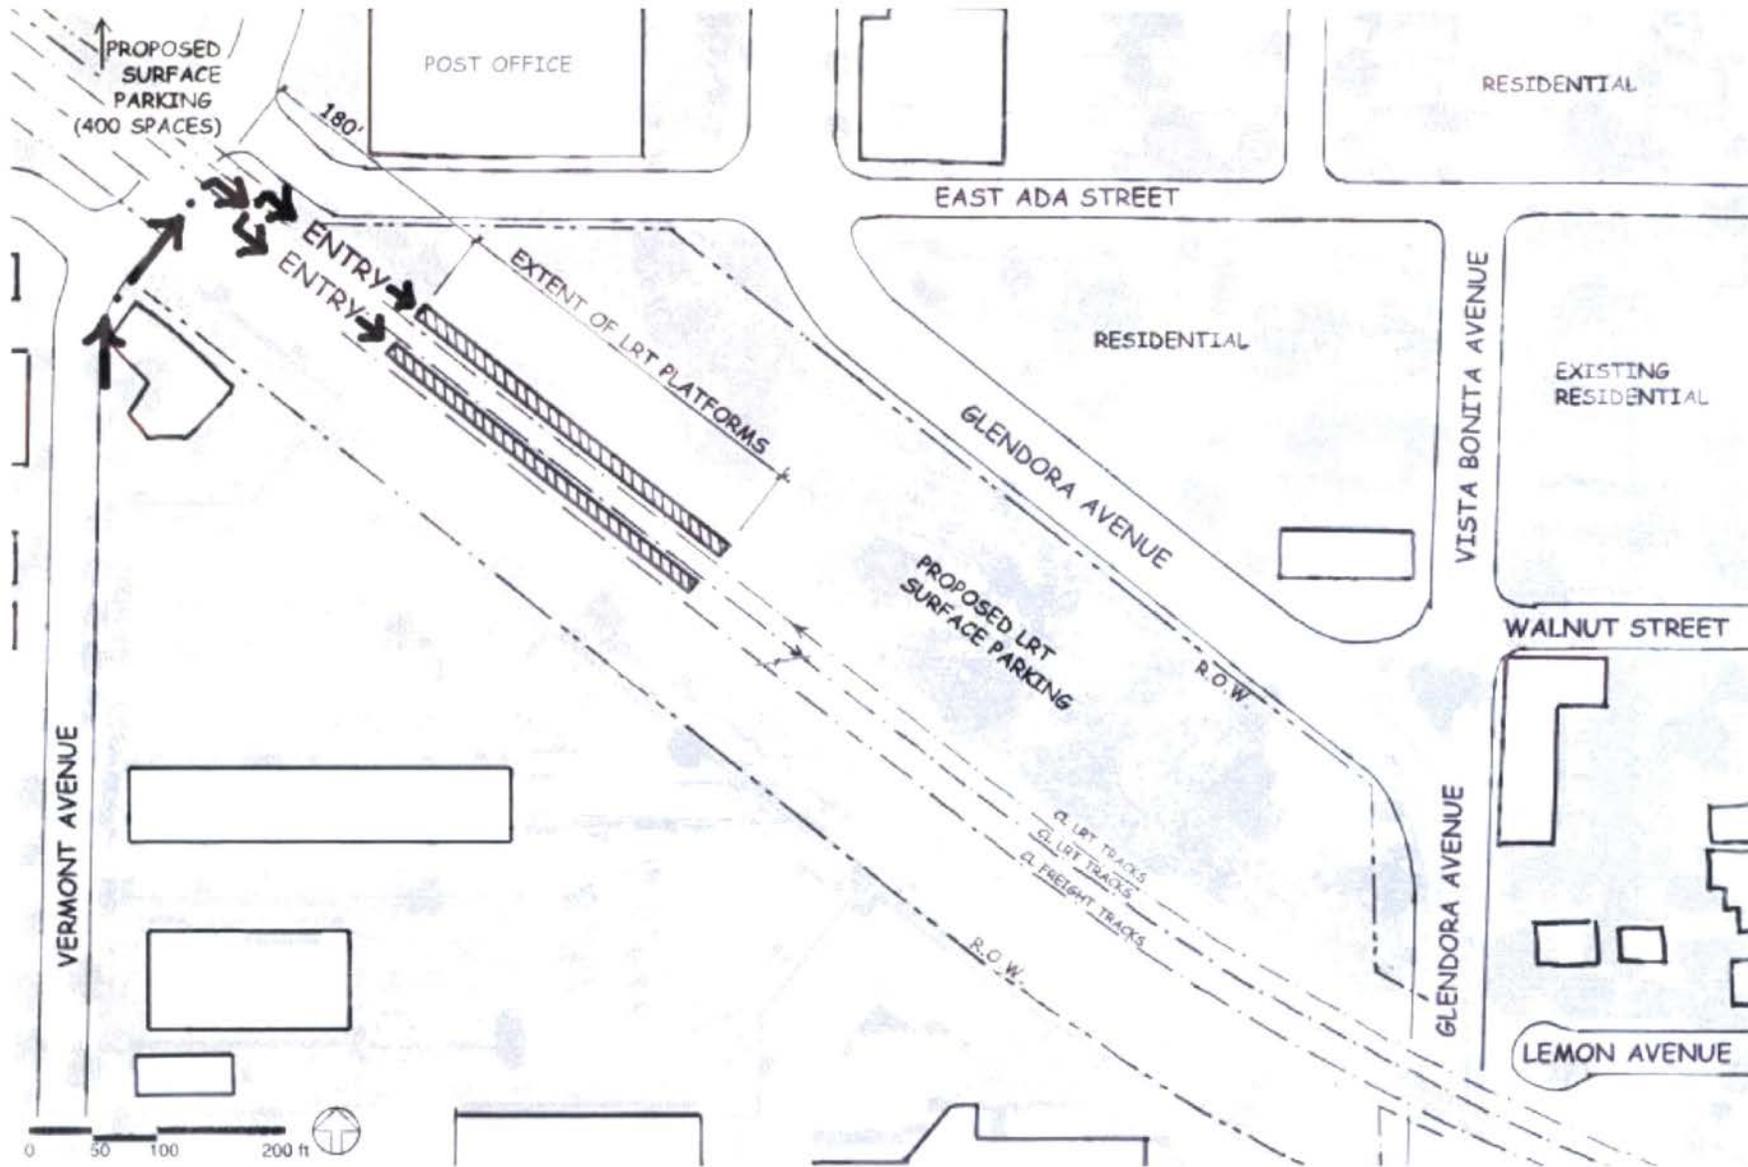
Site Plan: City of Glendora Station, 3-Track Alternative
